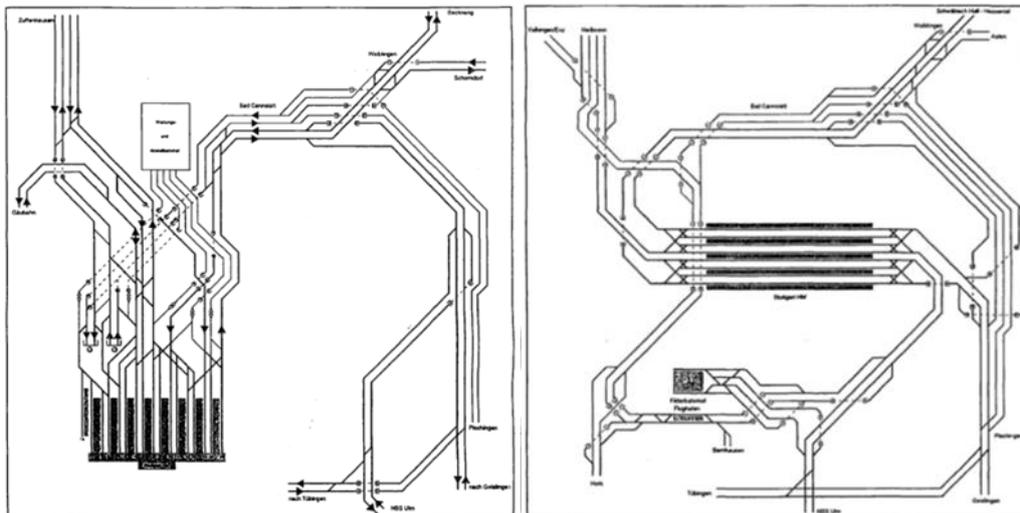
Track layout of the existing main railway station Stuttgart (left) and of the planned new underground station Stuttgart 21 including the new high-speed link to the new airport station and Ulm (right) (source: Heimerl, 1997a)
